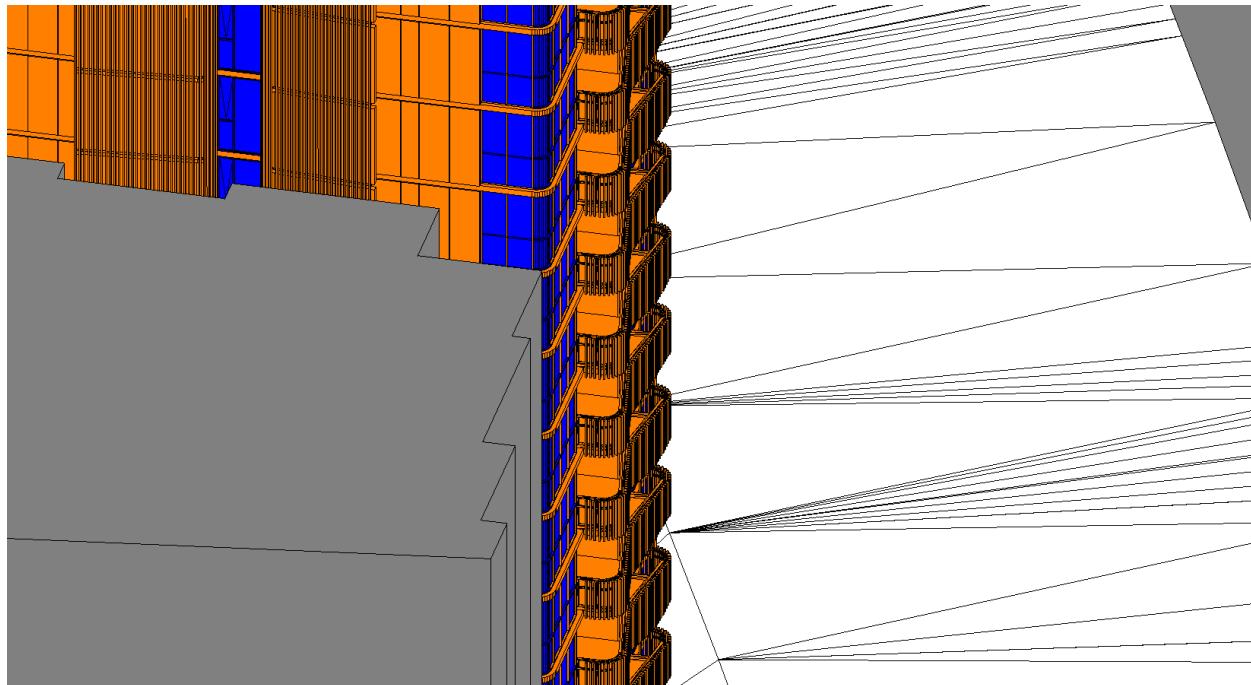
Solar Access to Apartment T3-15-05 at 1300 and 1315
